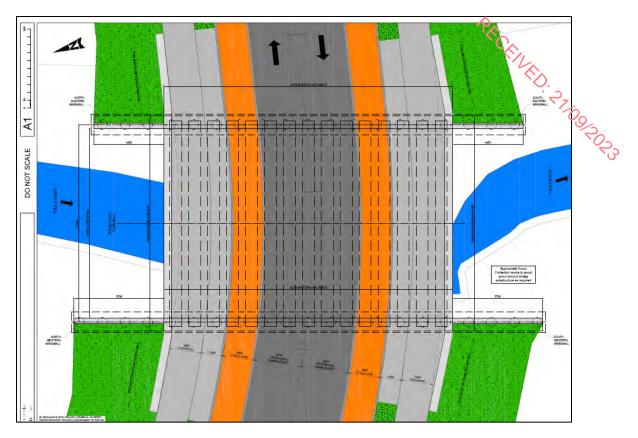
Image adapted from Atkins Drwg no: 5205505-ATK-ZZ-ZZ-SK-CE-001701, showing the proposed Layout Plan of the Bridge over the Tolka.
